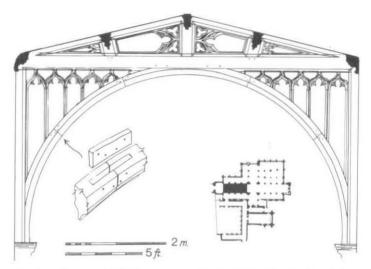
Cathedral nave: 15th/19th-century roof-truss looking E., with detail of scarf-joint.
